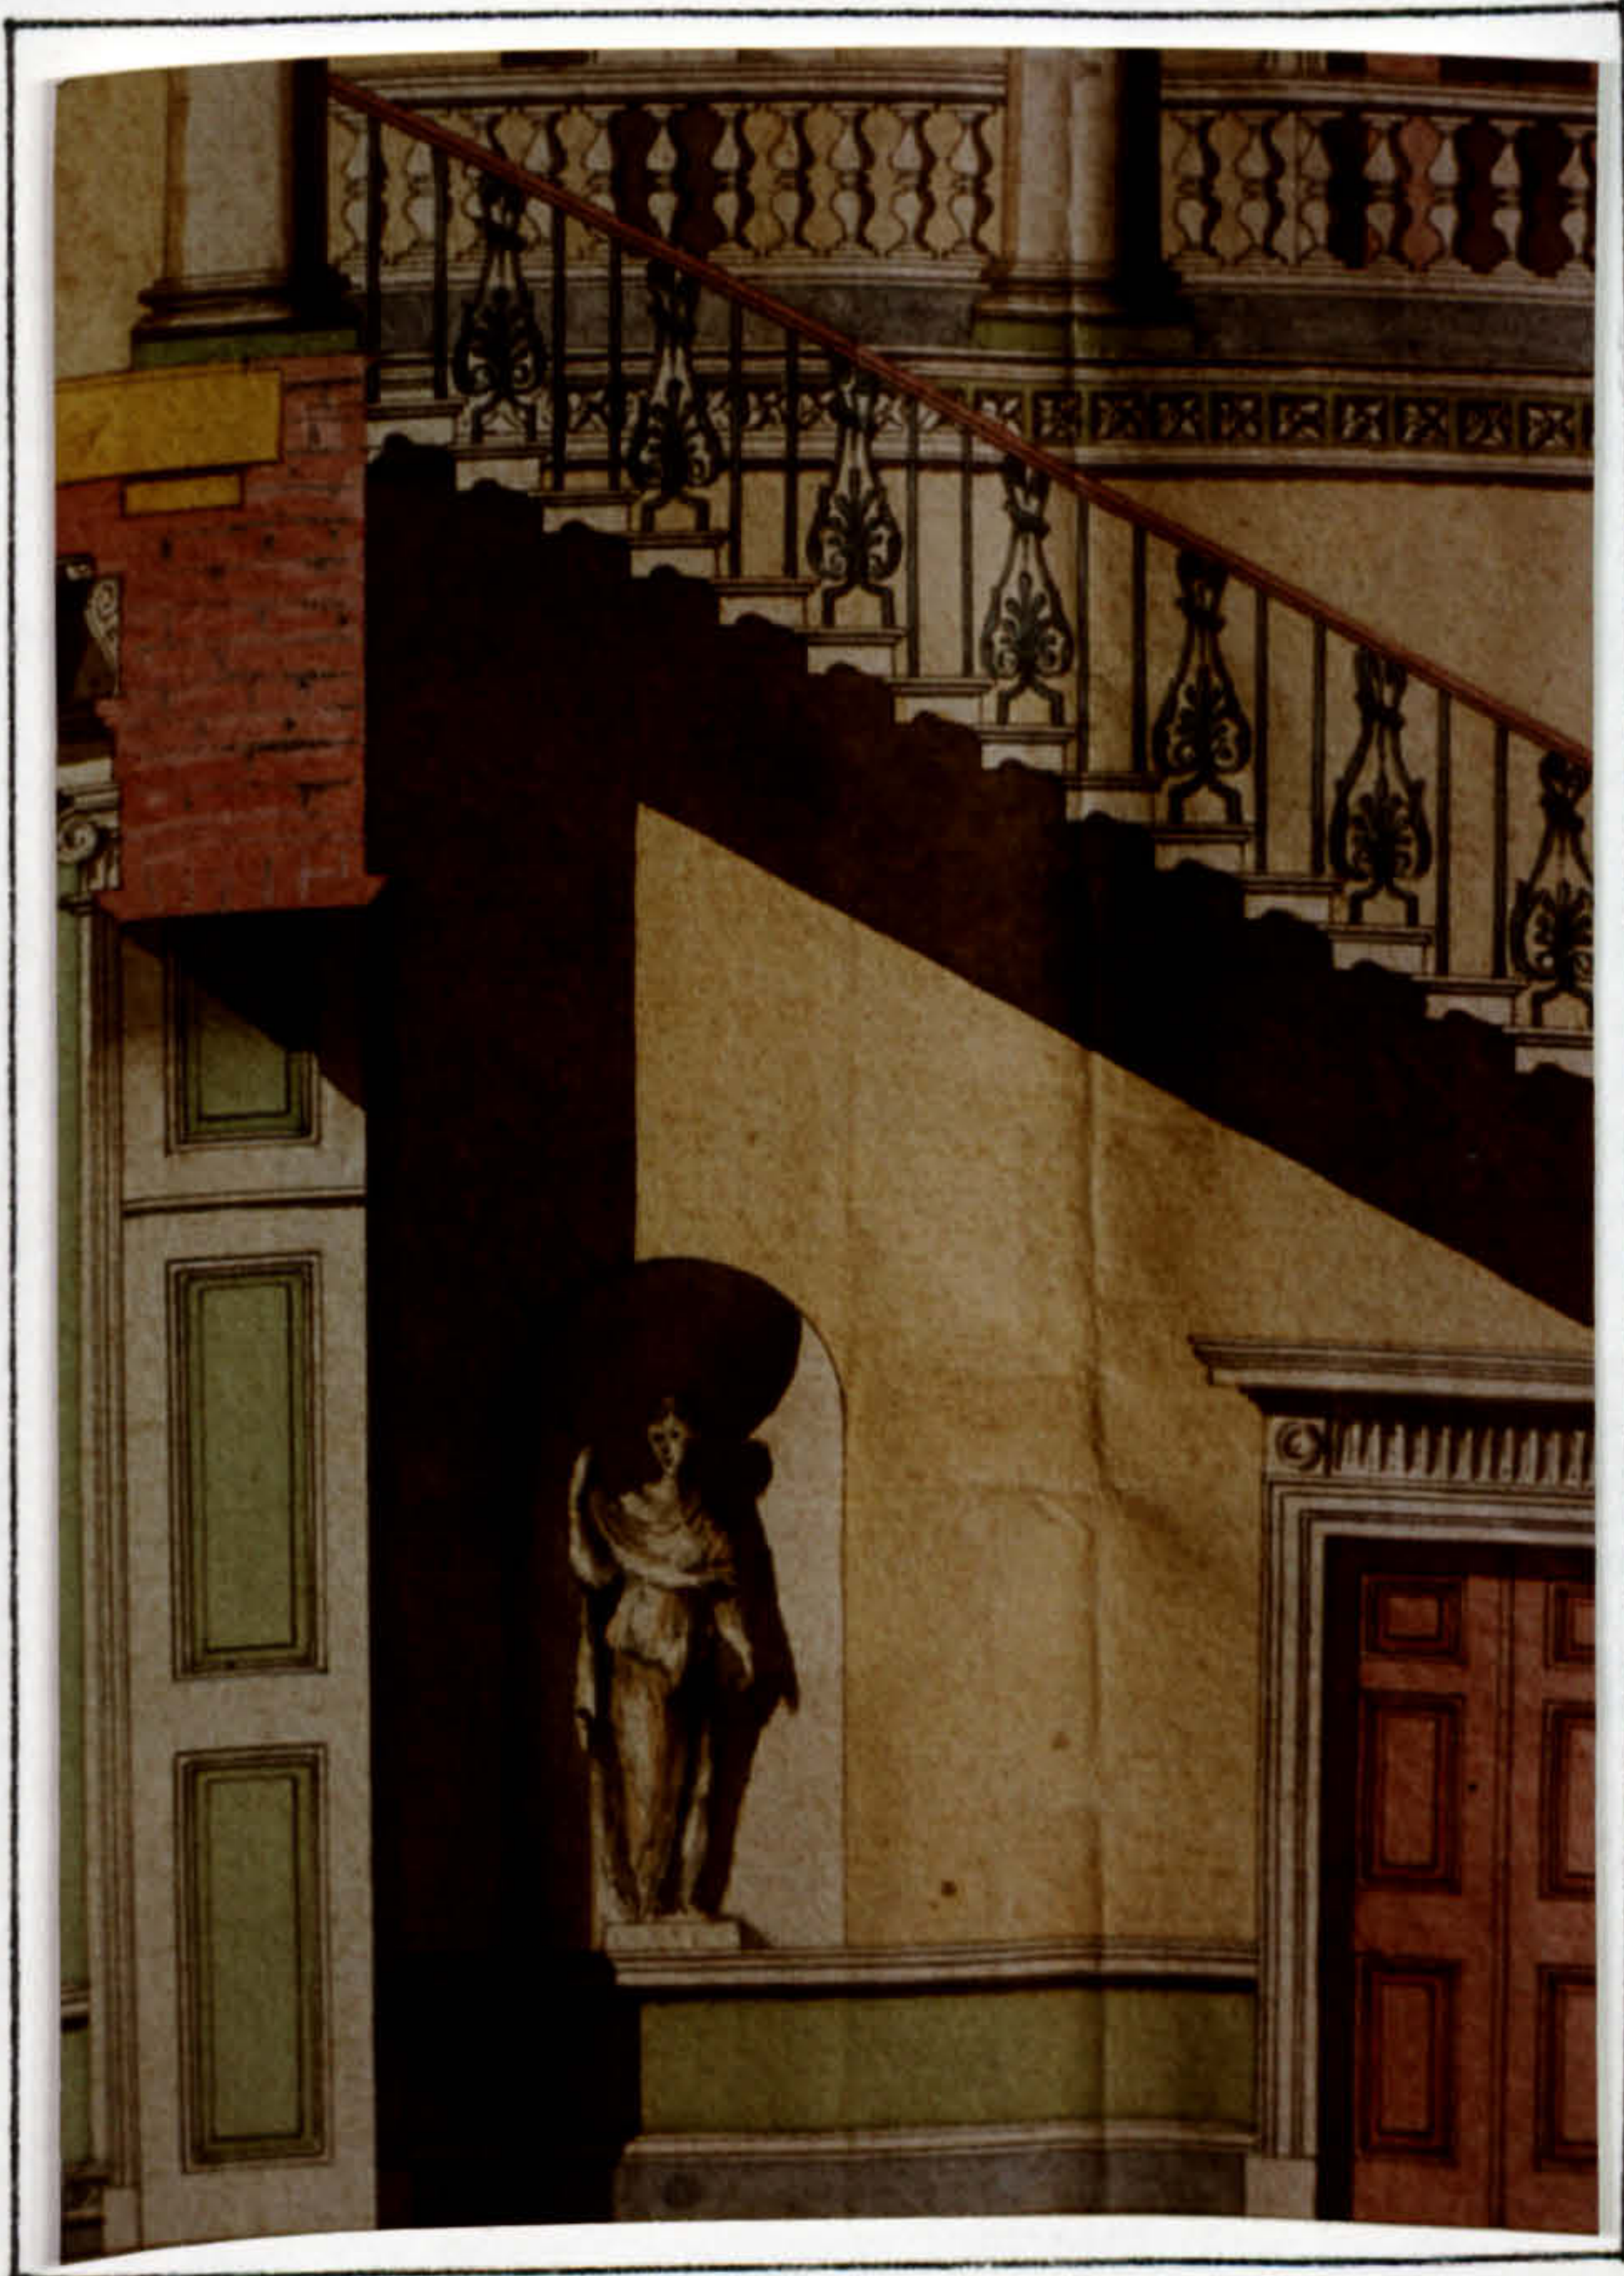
ROBERT ADAM · ELEVATION FOR MR. THYNNE'S DRAWING ROOM
